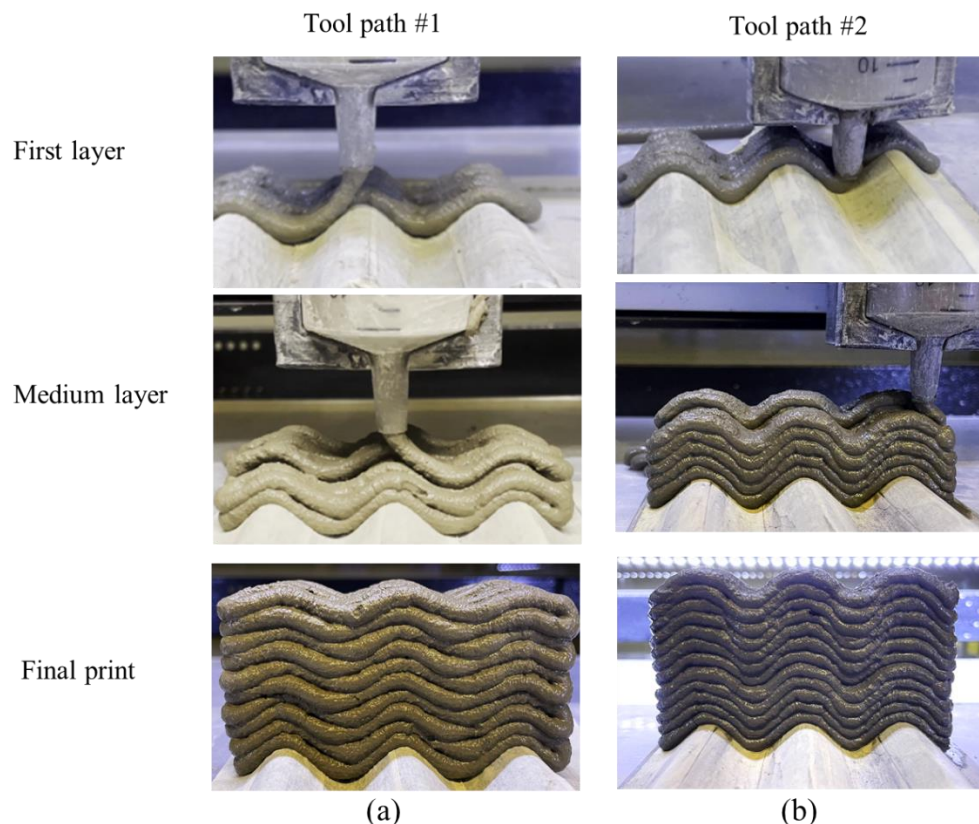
3D concrete printing technology is used by TRANS-IPIC researchers to fabricate bio-inspired designs for precast road barriers.
